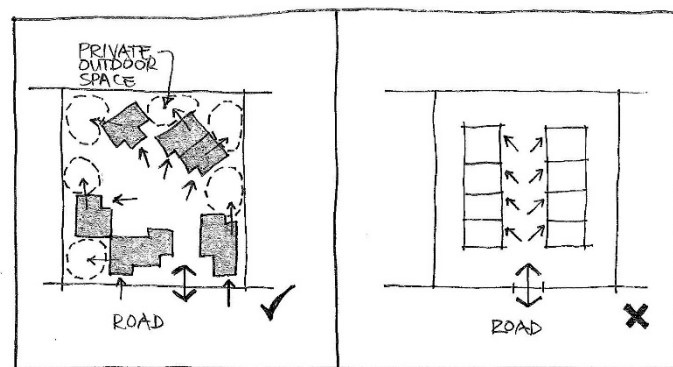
Carefully considered layout of buildings on sites helps to contribute to a more pleasant living environment.
